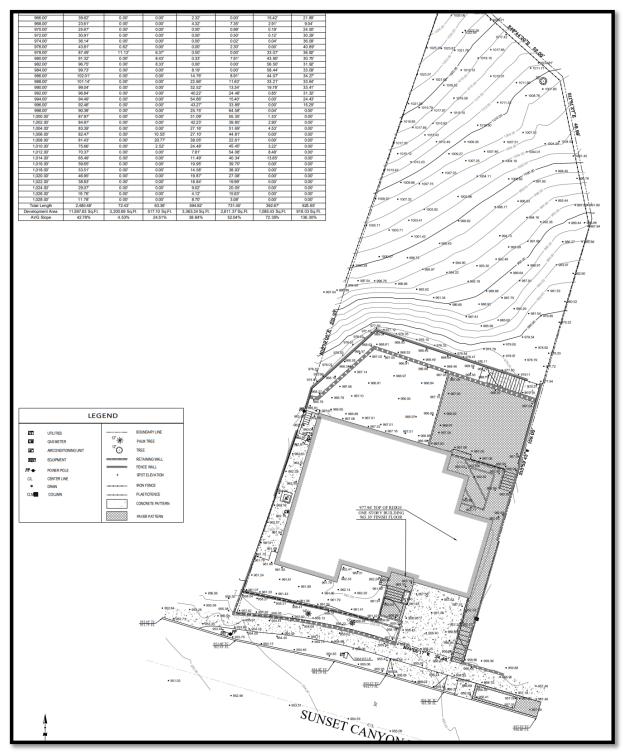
Topographic plan of the subject property [Source: MLB Consulting and Engineering, Inc. Topographic Survey].
